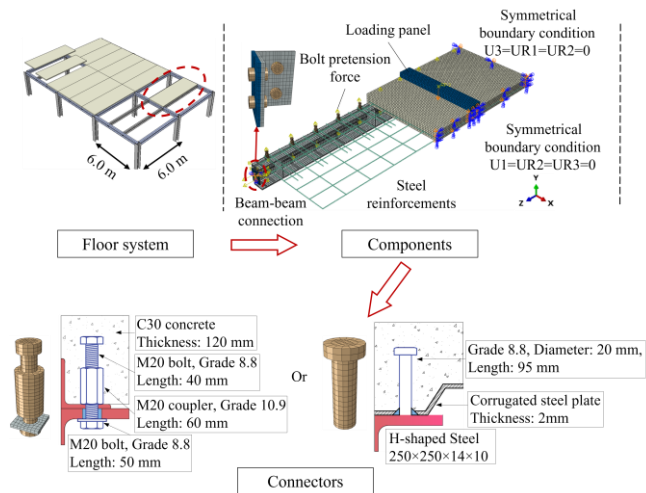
Schematic diagram of the demountable floor system and the floor system with welded shear studs under various scales.
